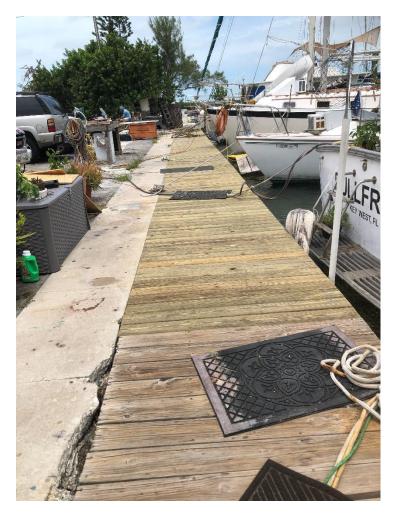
Structures have been repaired to good condition. Photo can be compared to Photo 1.
